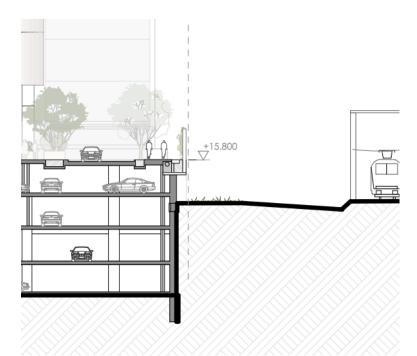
Section from submitted plans showing the elevation of the base of the building, roadway and public access
